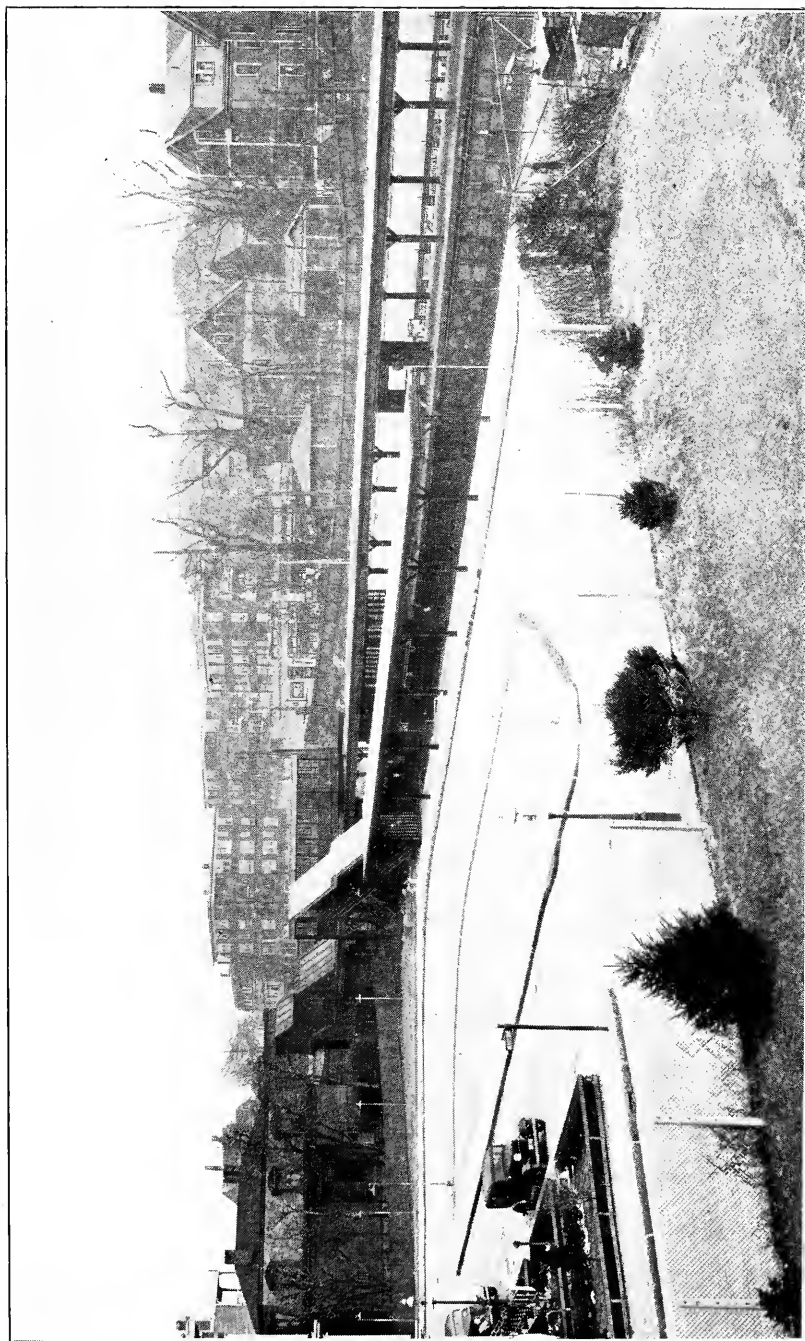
PLATE IX.—SAVIN HILL BUSWAY STATION AND OVERPASS.
